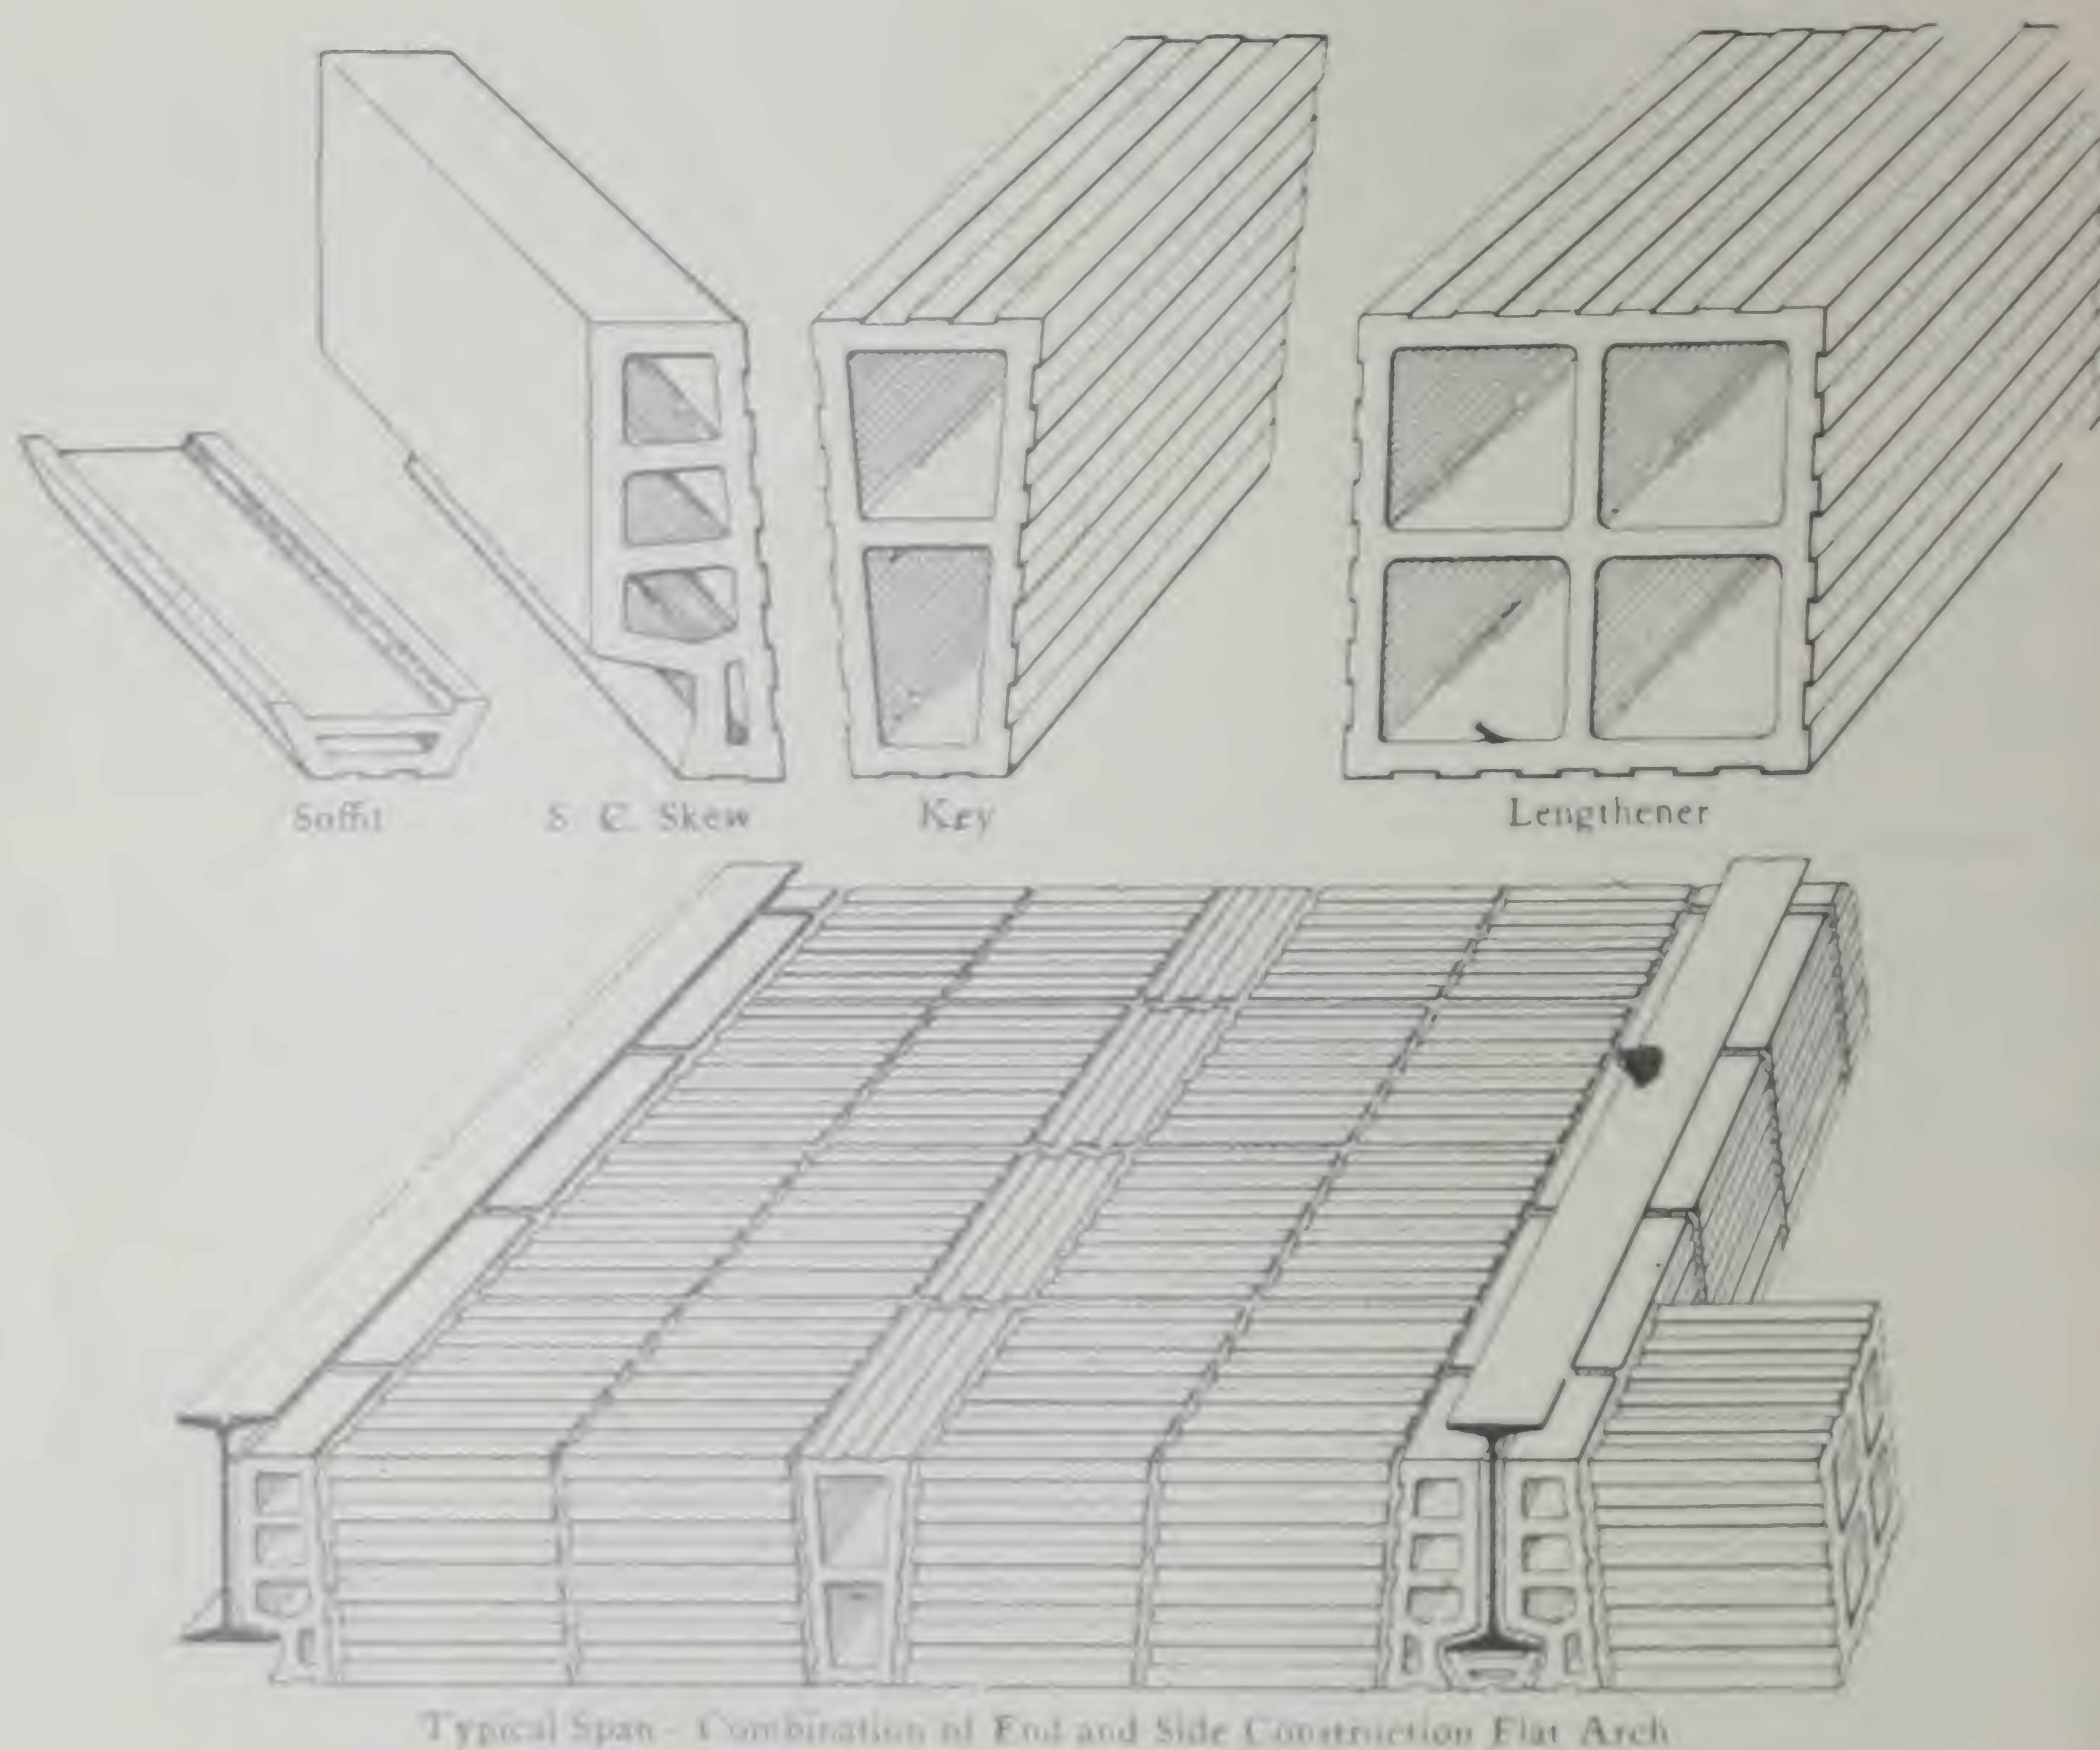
FLAT TILE ARCHES ARE ADAPTABLE TO HIGH BUILDINGS.
